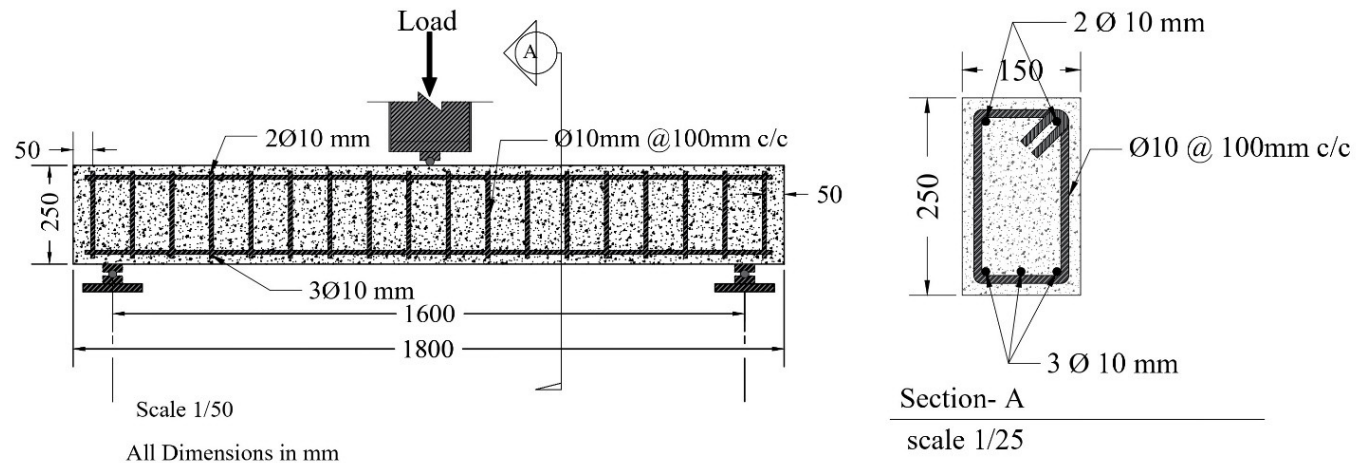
Longitudinal, cross-section, and centre point load test of beam.
